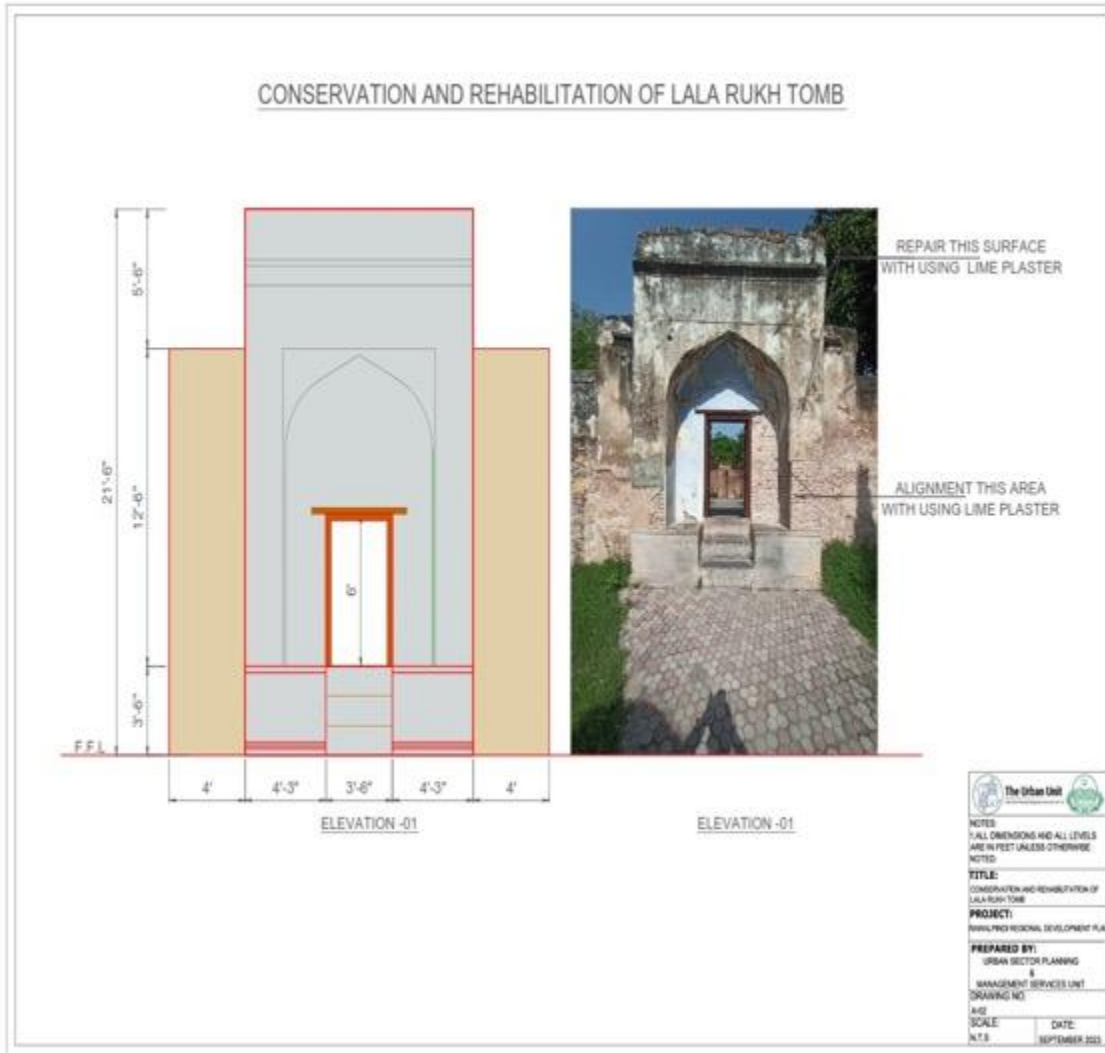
Proposed Conservation Plan of Wall Lala Rukh Tomb Hassan Abdal
